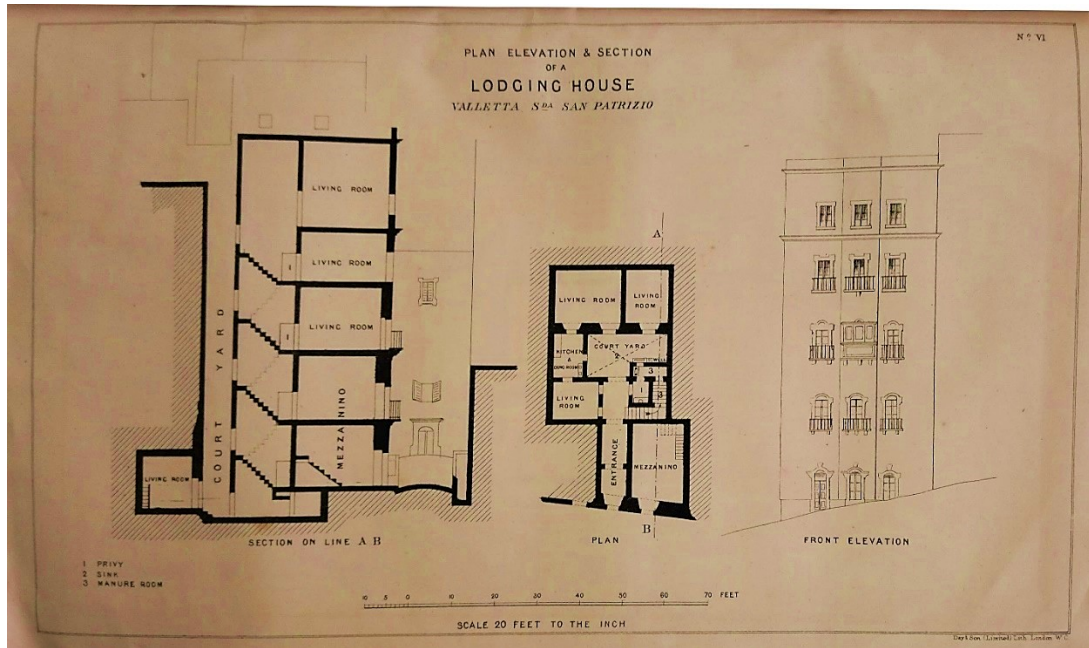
Plan, elevation and section of a lodging house in St Patrick Street on the border of the *Manderaggio*⁷¹
